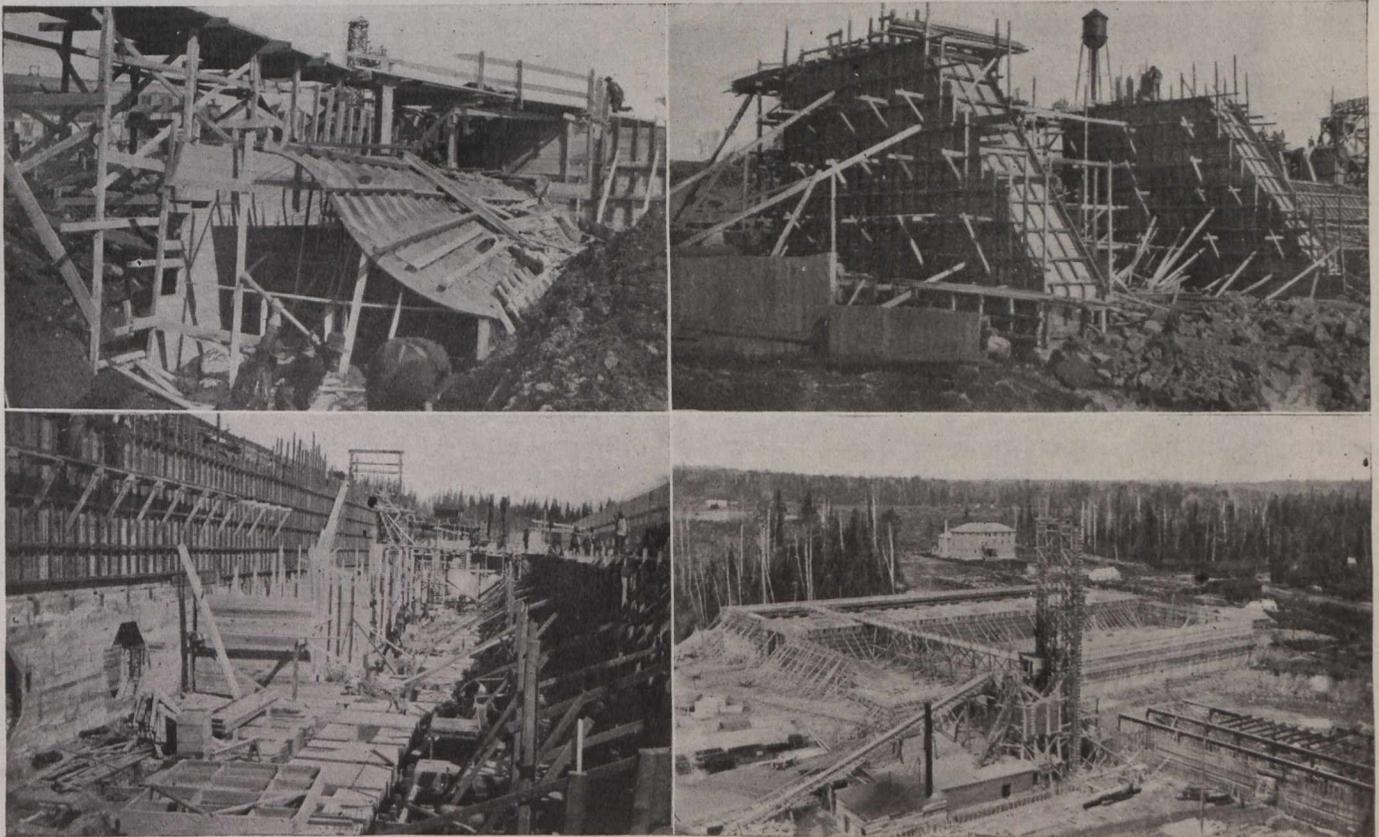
Formwork Typical of Dam, Power House End of Dam. Breast Wall and Floor of Power House.
